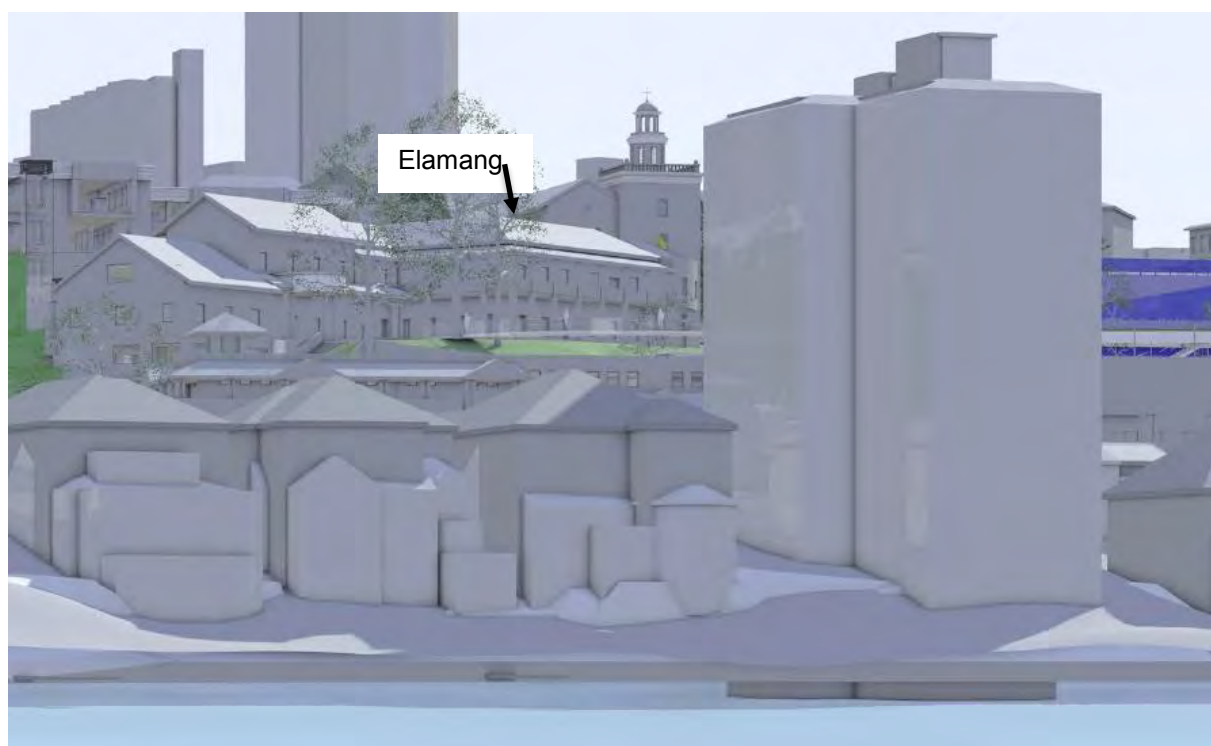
Viewpoint B—21 Elamang Avenue blocks views of the proposed pod, although the raised walkway will be visible. (Source: Excerpt from fjmt drawing SK-7.9.2)
